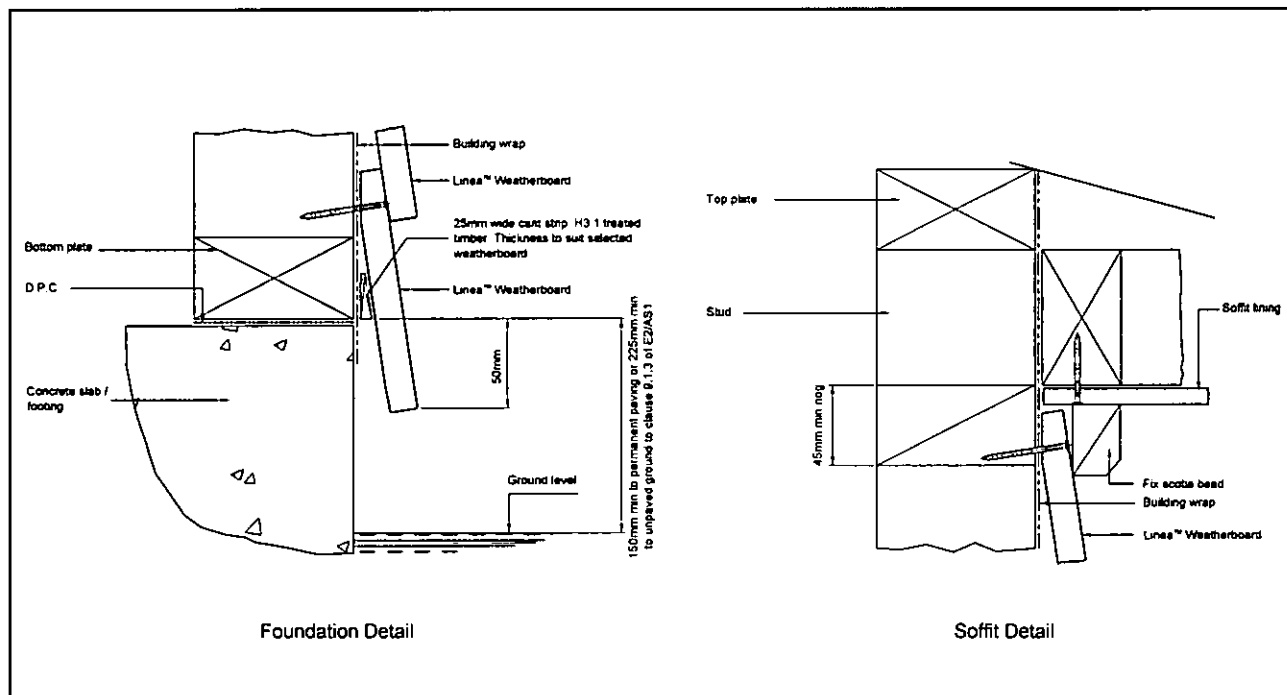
DIRECT FIX FOUNDATION DETAIL AND SOFFIT DETAIL
